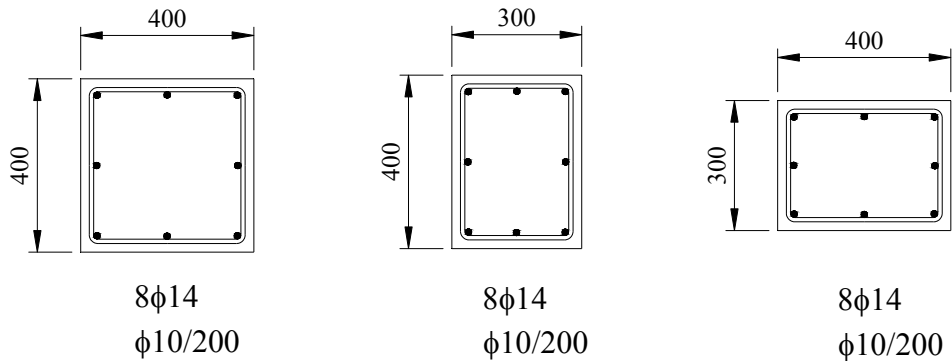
Reinforcement scheme of the columns at the second floor.
